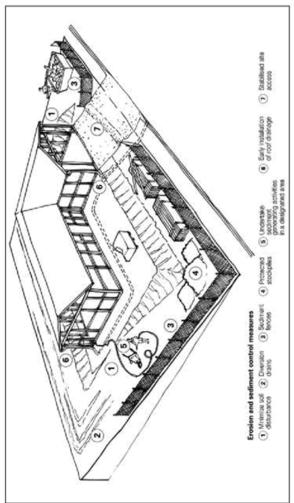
A: Appropriate sediment and erosion control measures for single residential building lots.
